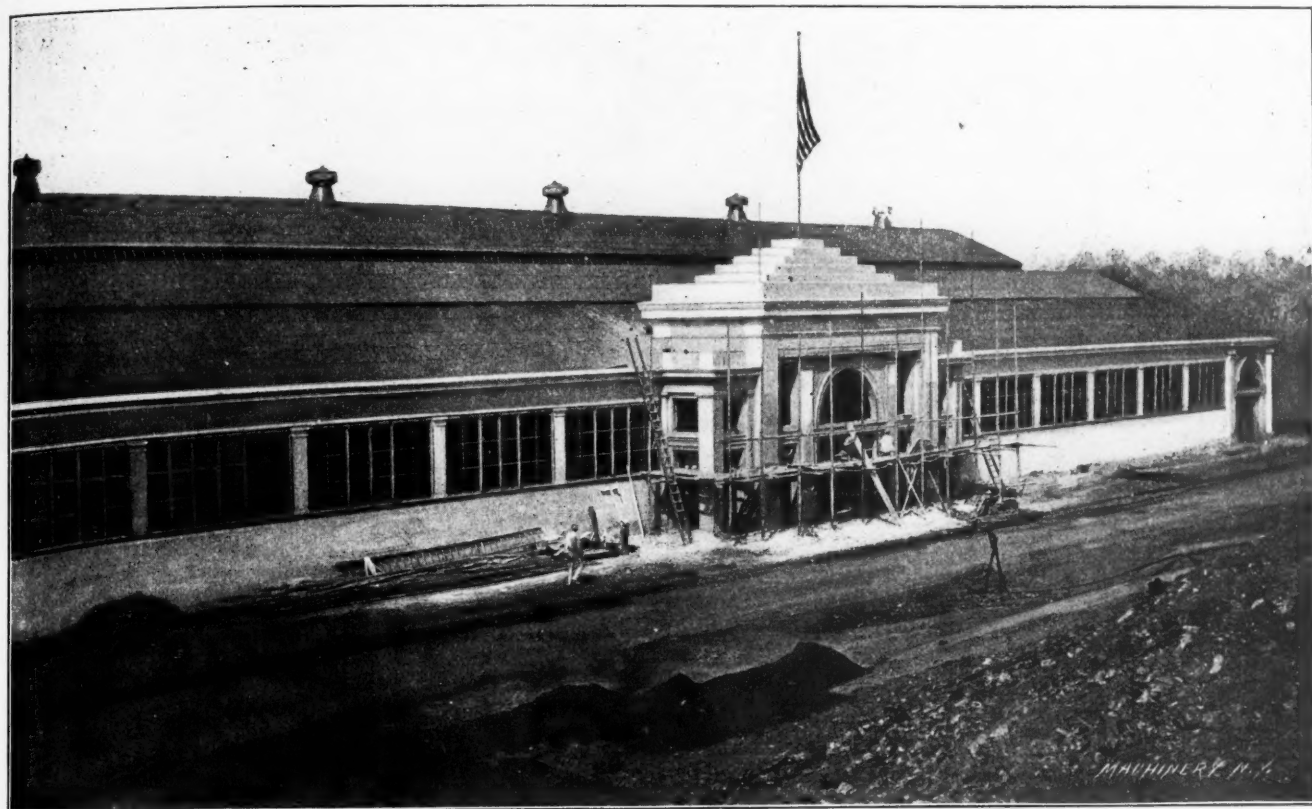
United States Machinery Building at Vincennes---The American Machine Shop equipped throughout with American Tools.
